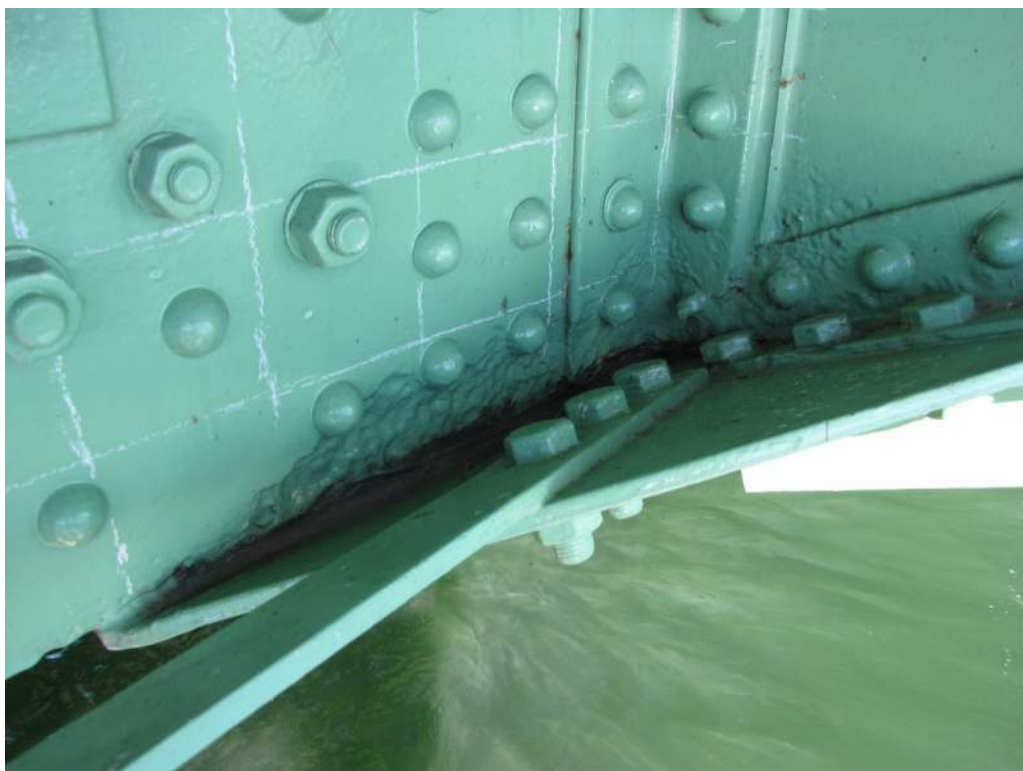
Severe localized section loss of south web of bottom chord member 4S-6S at FB4.
